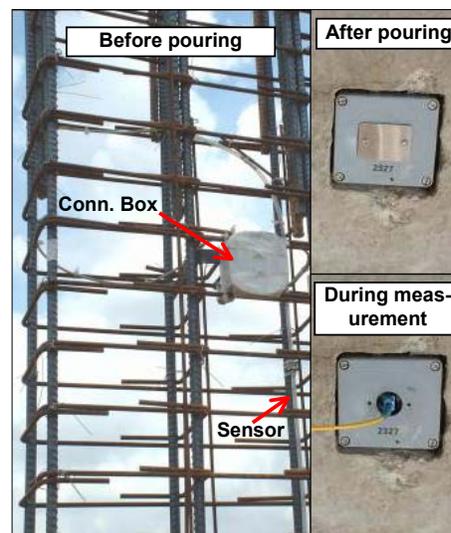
Sensor and connection box installed on a rebar cage, and connection box after the pouring of columns
